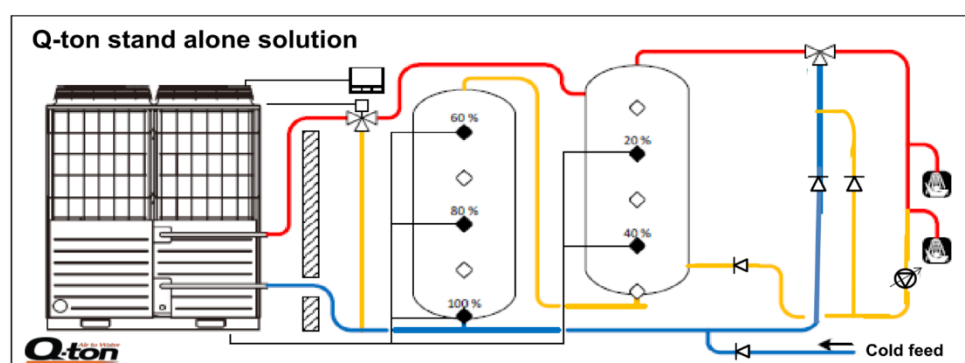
TYPICAL HEAT PUMP ARRANGEMENT USED IN DHW
